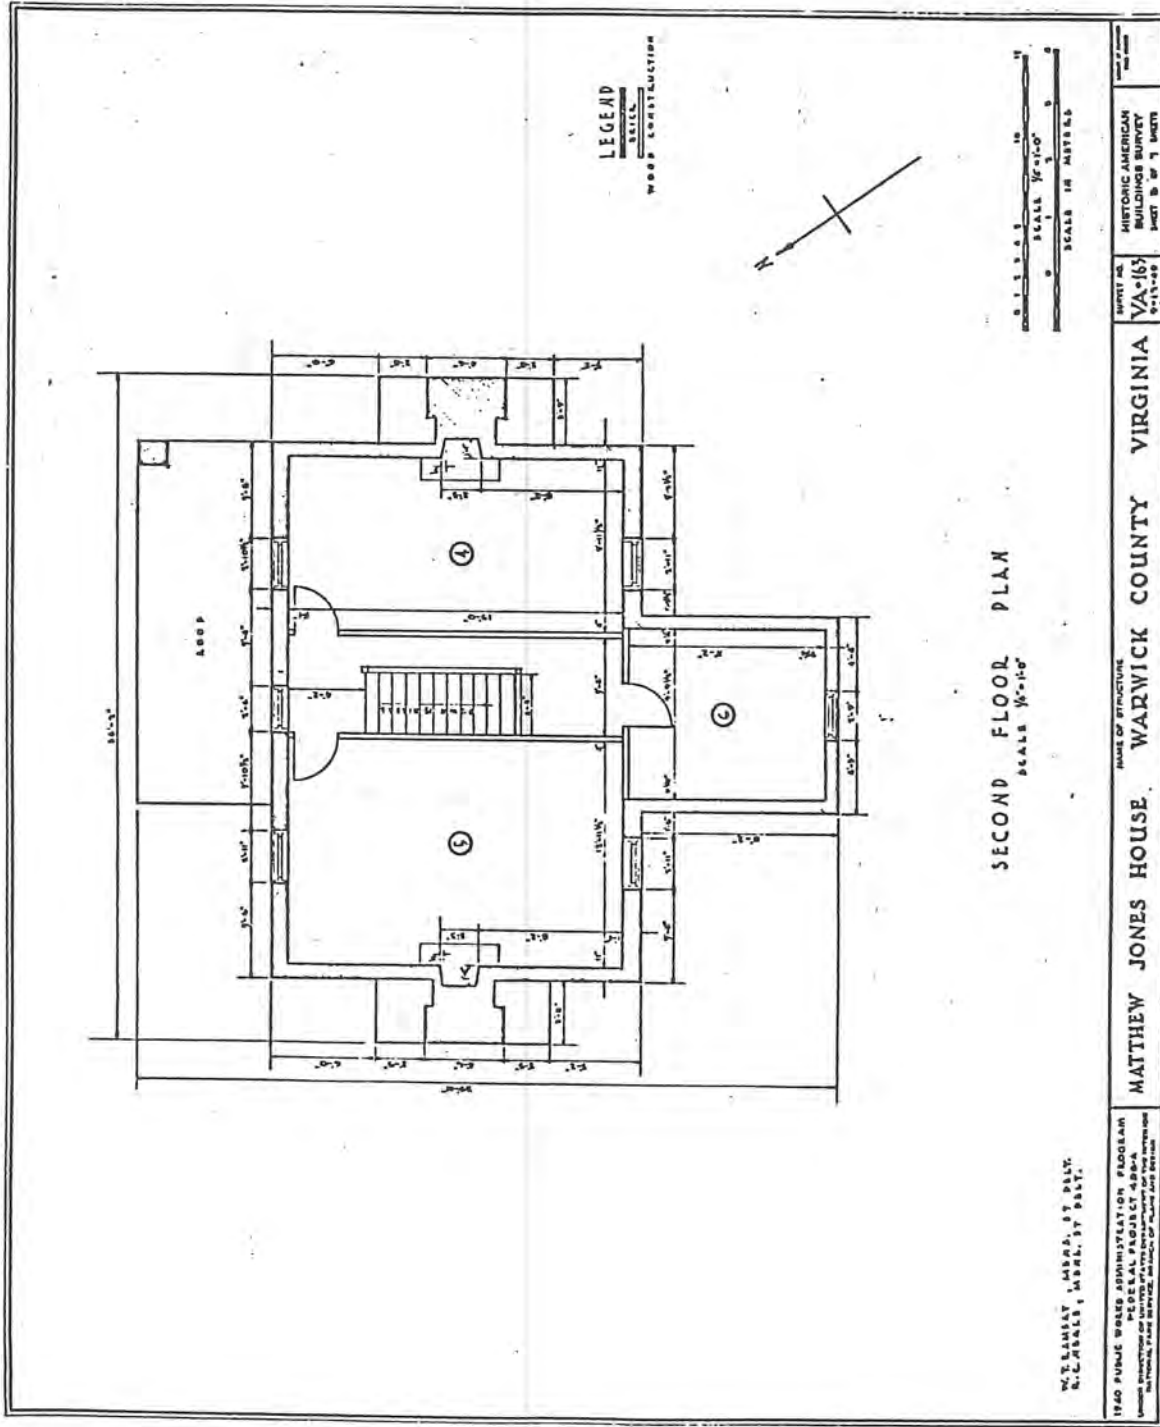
Matthew Jones House, HABS drawing (1940), second-floor plan.
